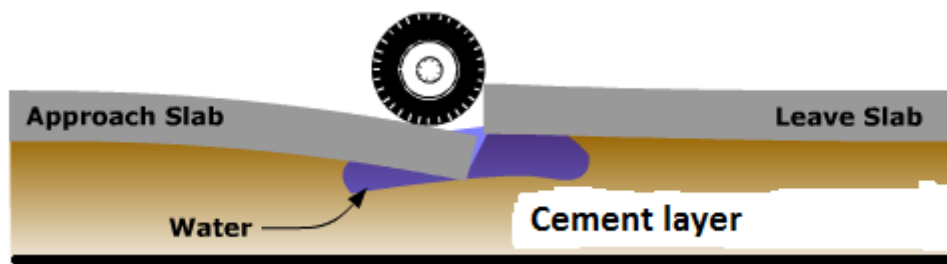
, Pumping and Faulting Load act at approach slab (Muench, 2003)
